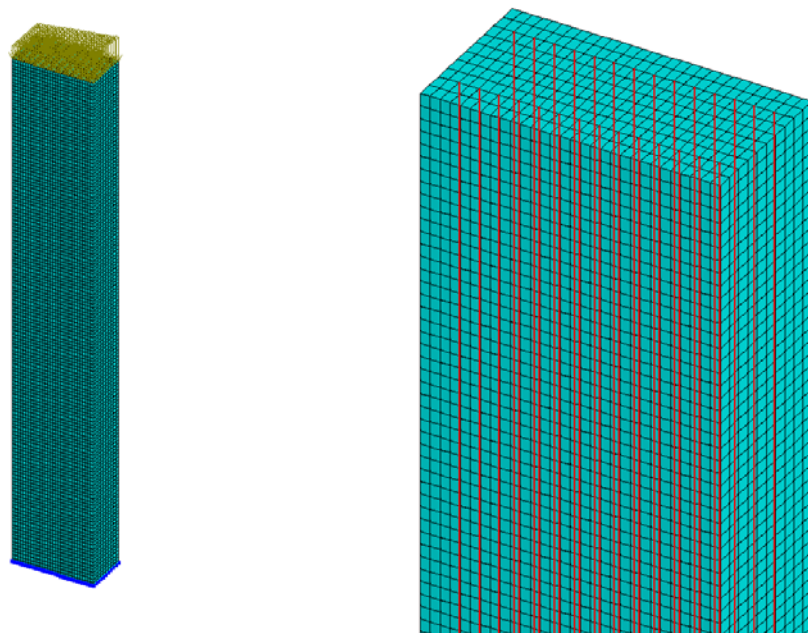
3D model of reinforcement concrete column with steel rods
